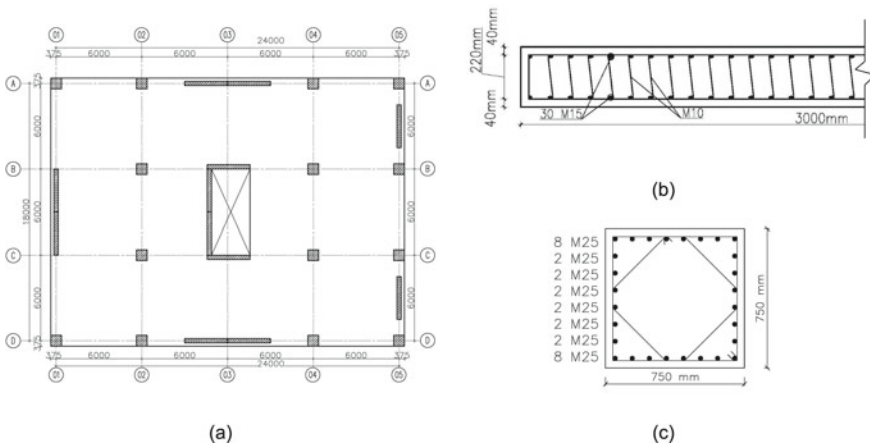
a Benchmark plan layout, Concrete dimensions, and reinforcement detailing for cross-sections of b Shear wall segment and c Column
